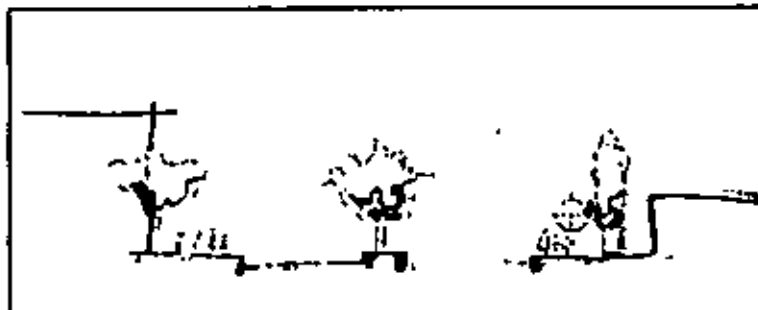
General site profile: Logging station Abdul Gani road (source of Illustrations: Ahmed, 1995).
